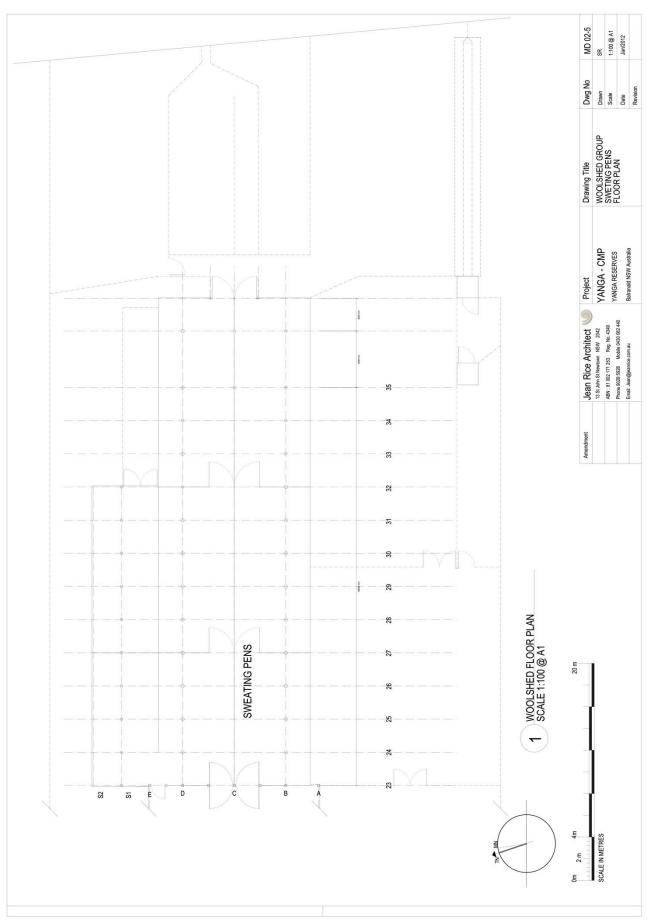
Woolshed Group. Woolshed - east-most portion of Woolshed showing the Sweating Pens floor plan. Jean Rice Architect, site assessment 2009.
